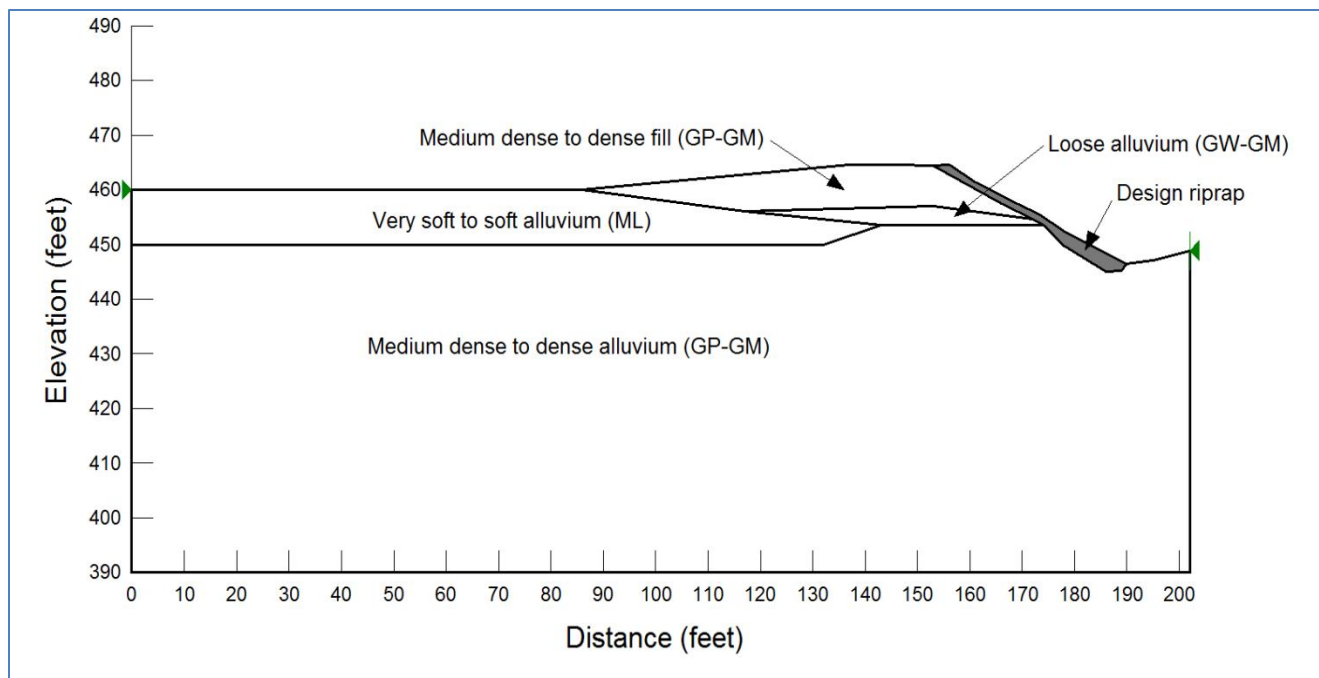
Levee Cross Section, Critical Section Location G-8
